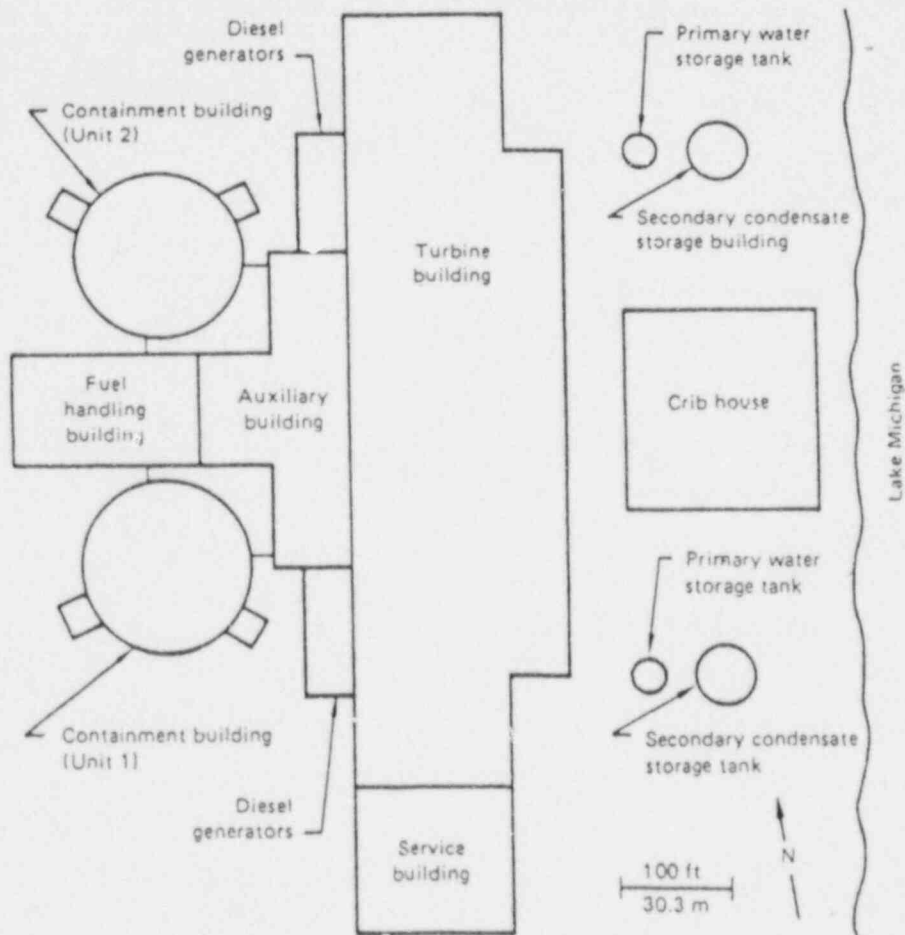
General Arrangement of Structures at the Zion Plant.
